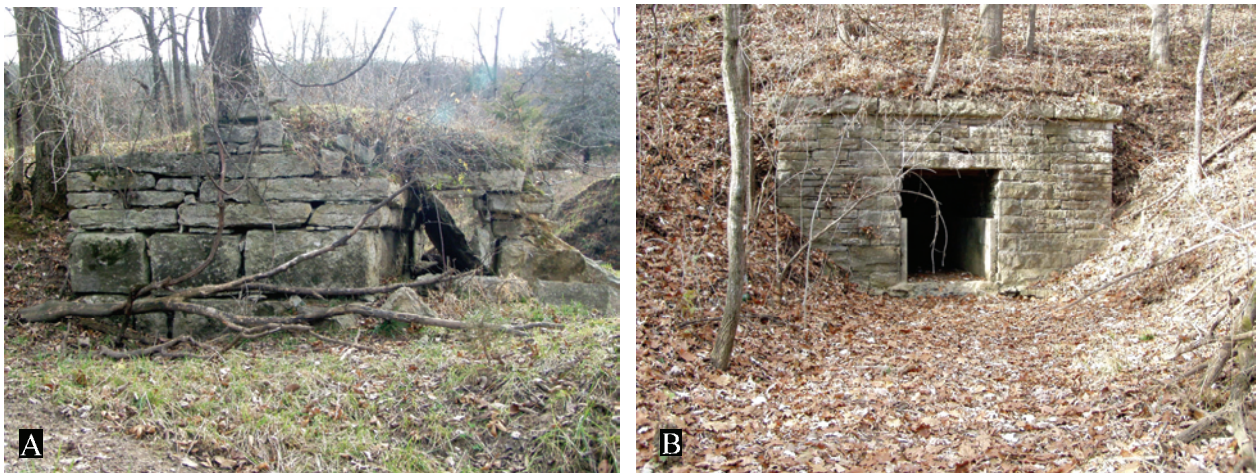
A. Dry laid stone slab bridge in Jockey Hollow, west of Lockridge, Jefferson County. B. Stone and concrete railroad to highway culvert conversion (1869–1930) east of Ottumwa. 2003 survey photos.
